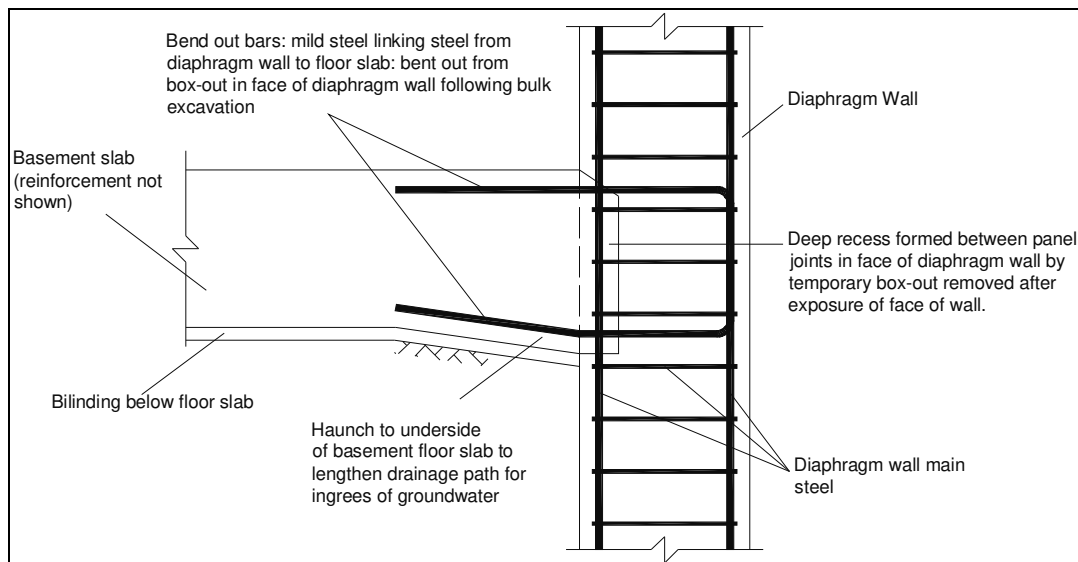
Horizontal joint between diaphragm wall and slab using box out method.
